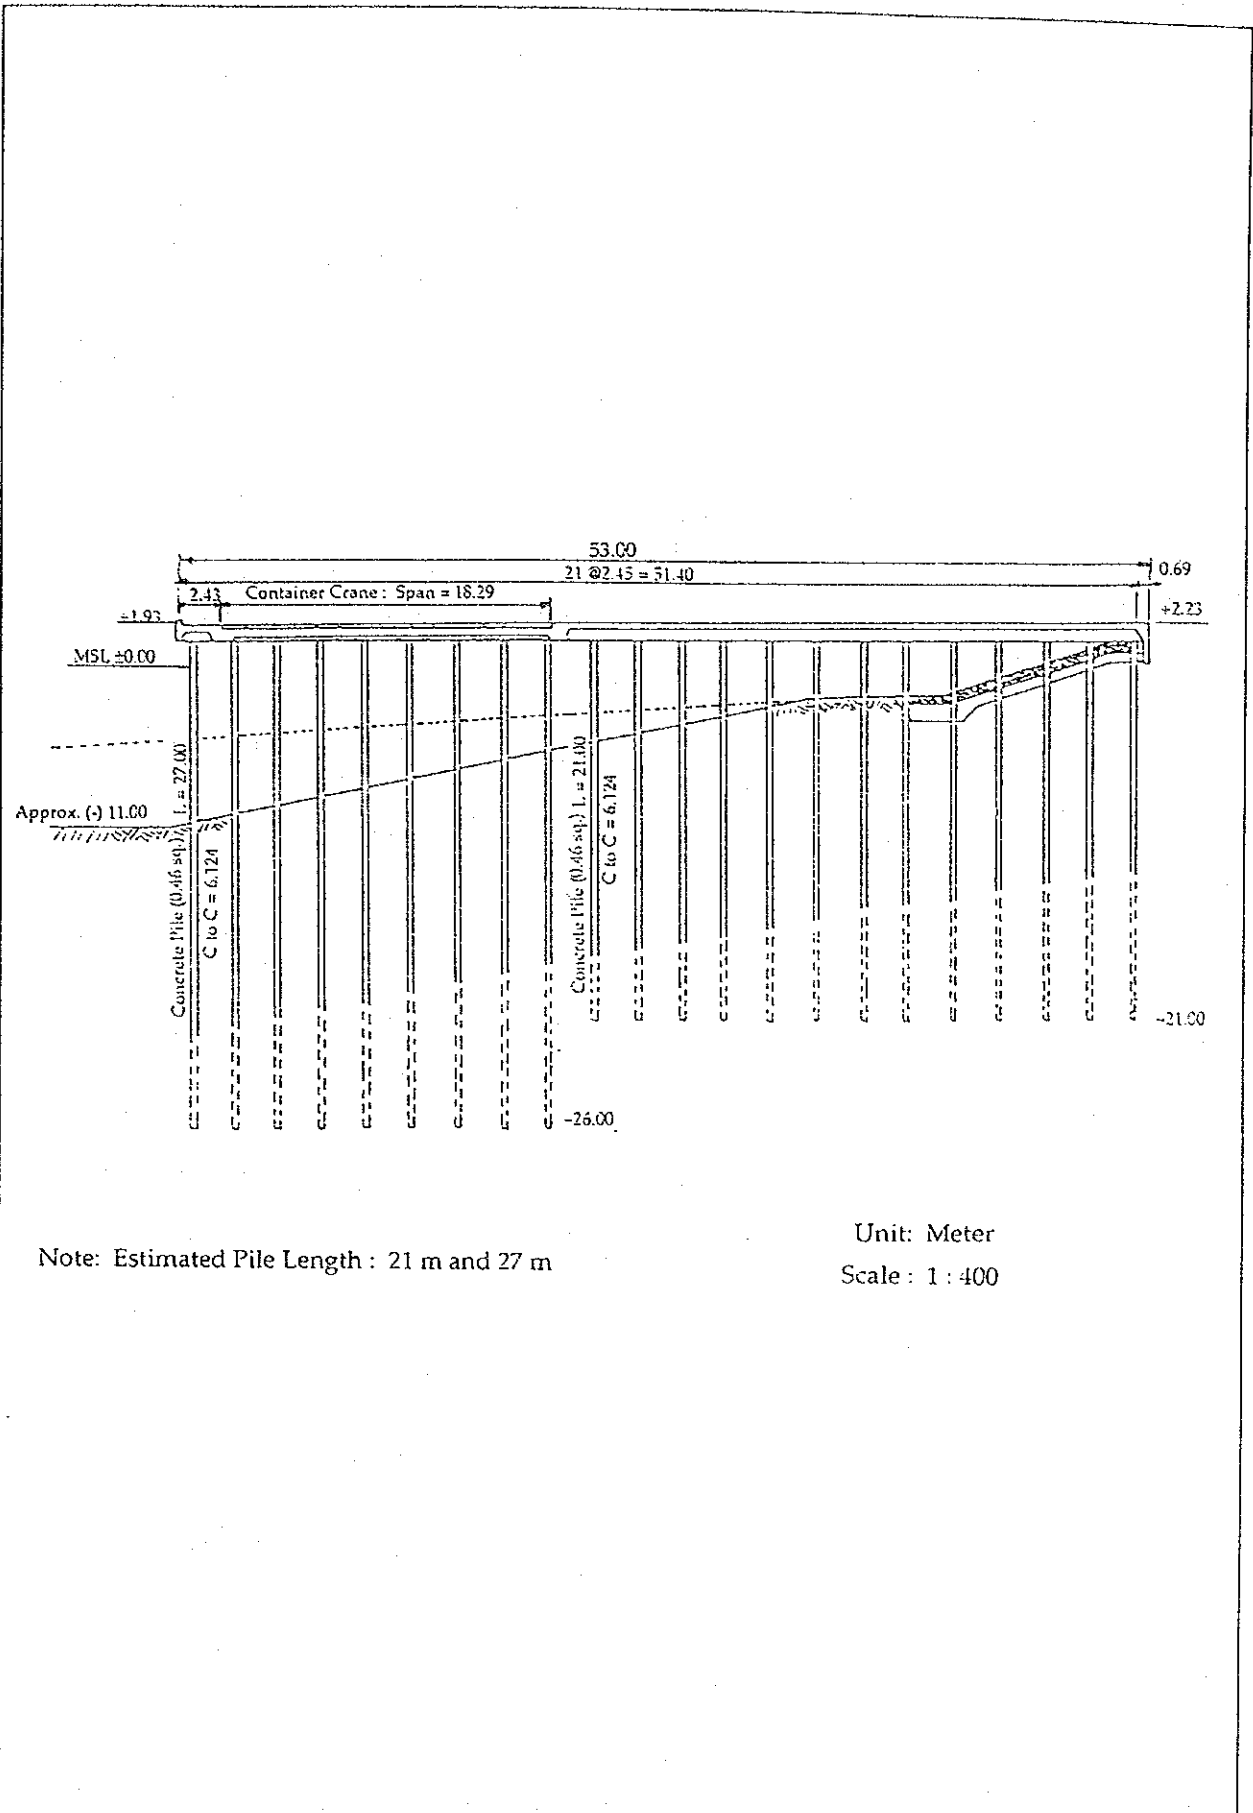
Typical Cross Section of Wharf No.5
